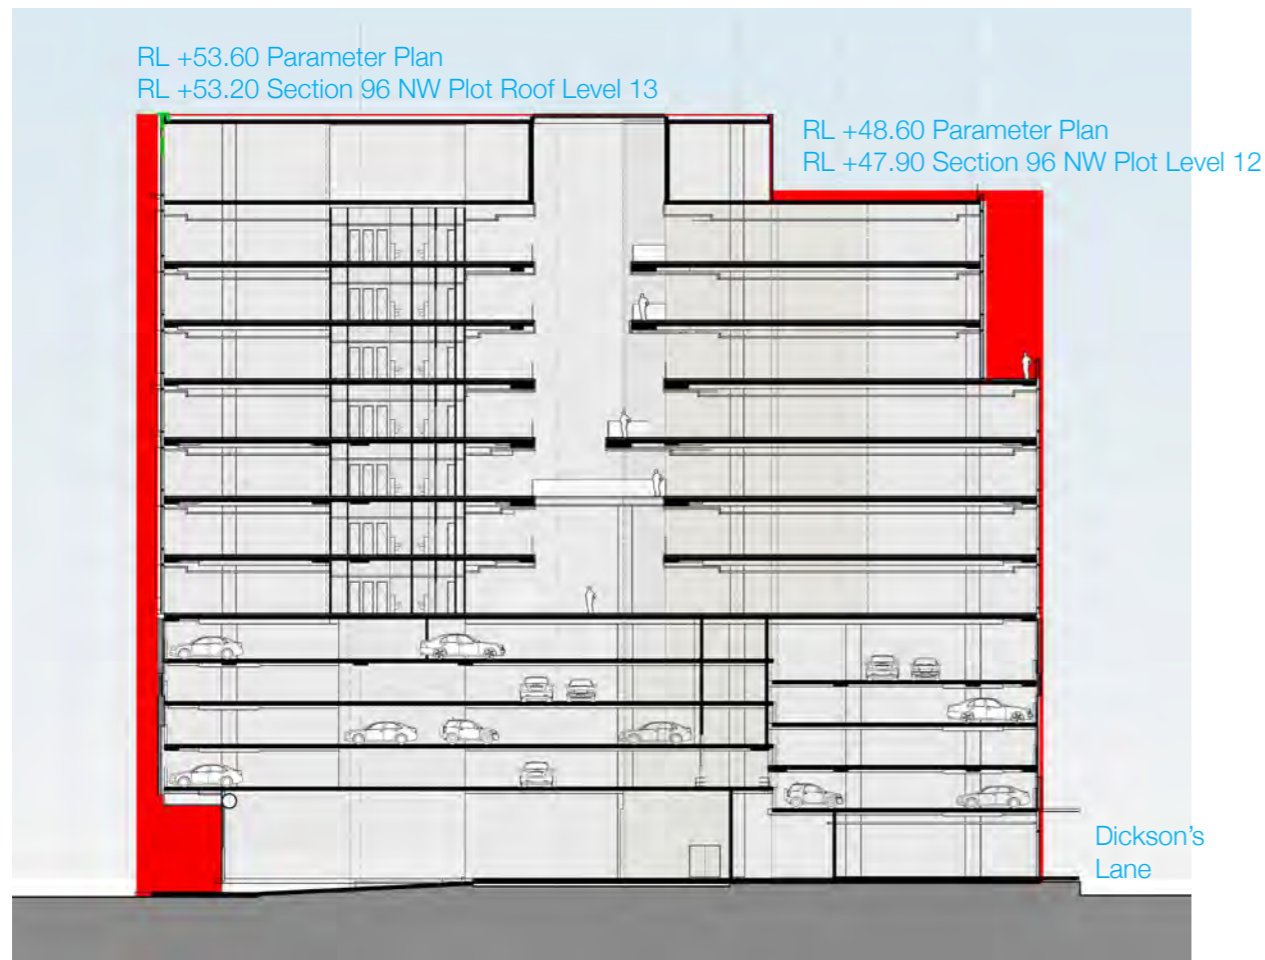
Section 96 NW Plot proposed building north south section with Parameter Plan envelope overlay
